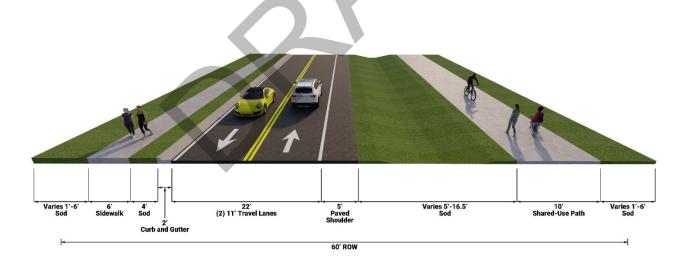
NW Quadrant Road – Typical Section from Sta. 207+25.48 to Sta. 213+51.14
